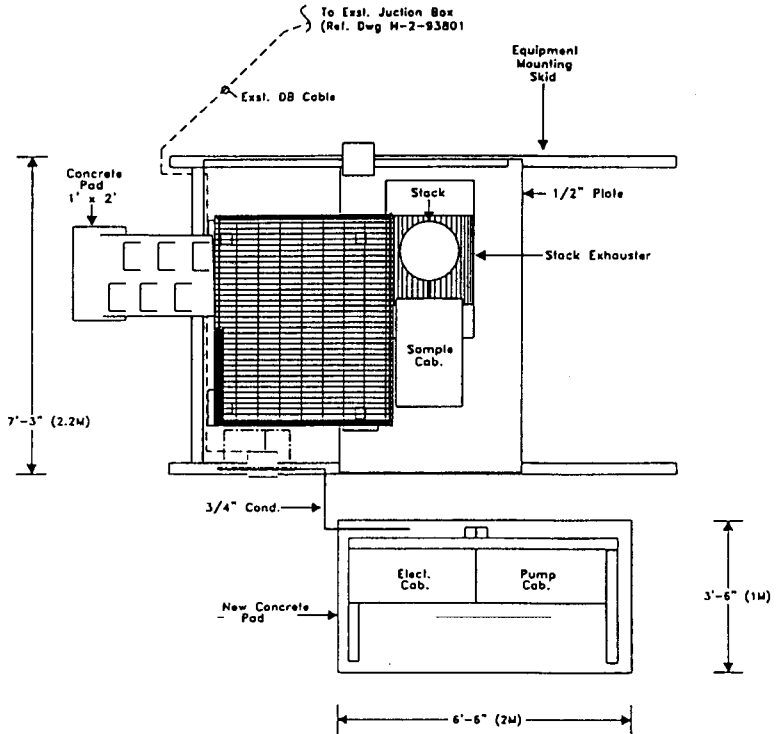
241-C-105 & -106 Exhauster GEMS Upgrade - Plan View of Equipment Layout
